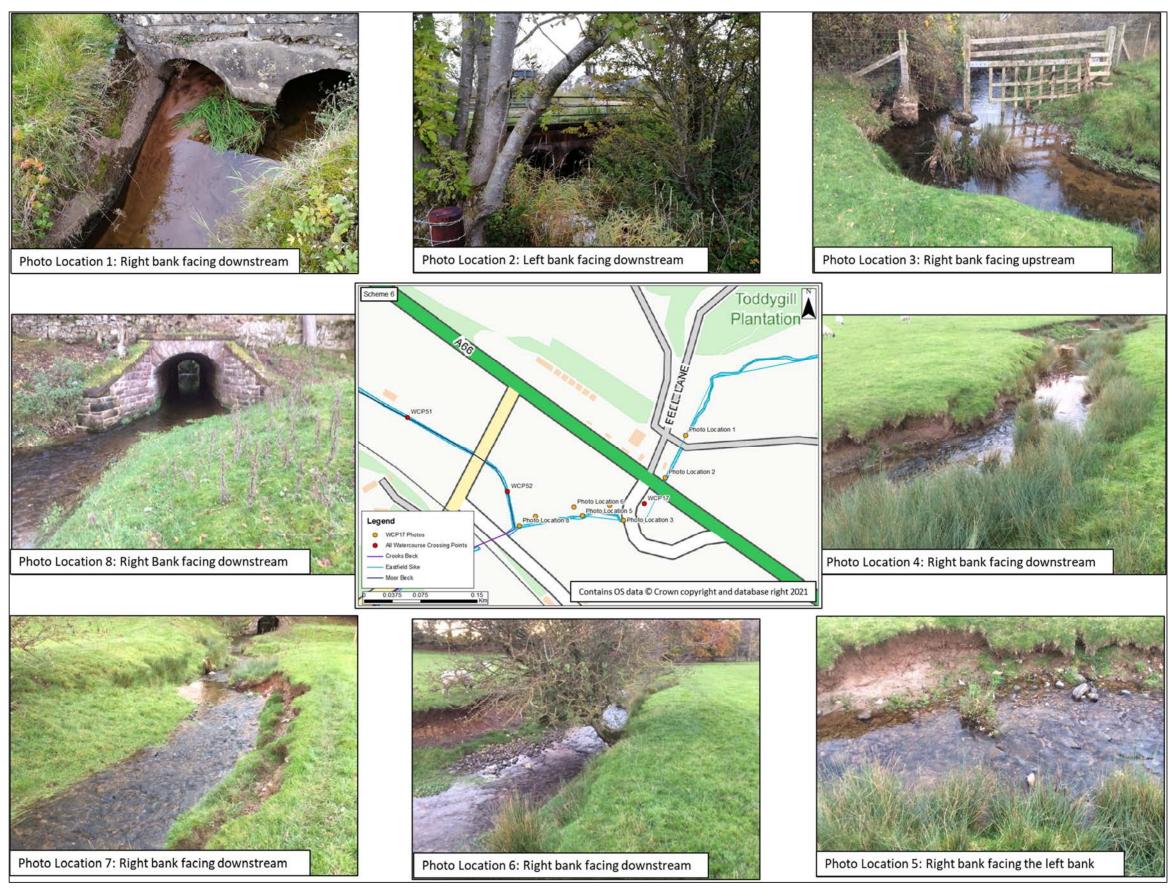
WCP17 (Eastfield Sike) site photograph locations
